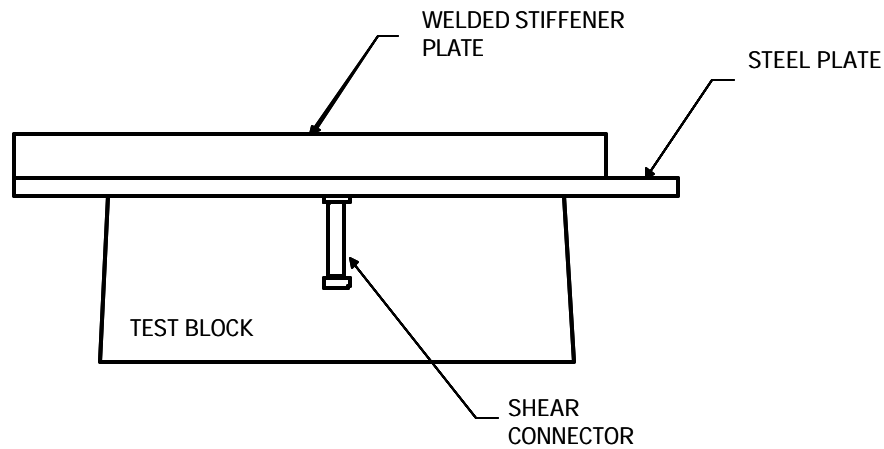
Typical test specimen (with welded shear stud)
